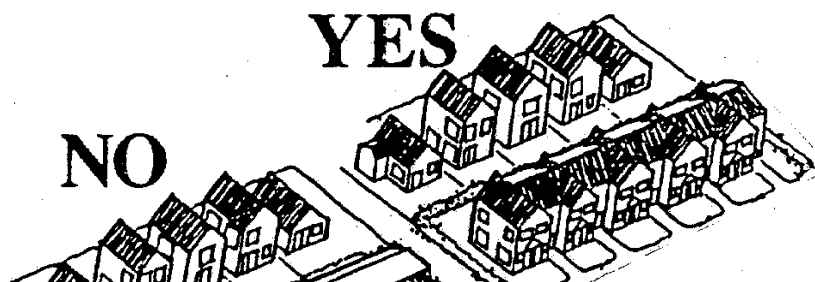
A(4) The building on the right shows how a multi-family structure can be designed to complement an existing neighborhood through the use of similar building modulation and setbacks. The building on the right covers roughly the same lot area as the structure on the left, while appearing as if it “fits” in its surroundings.
